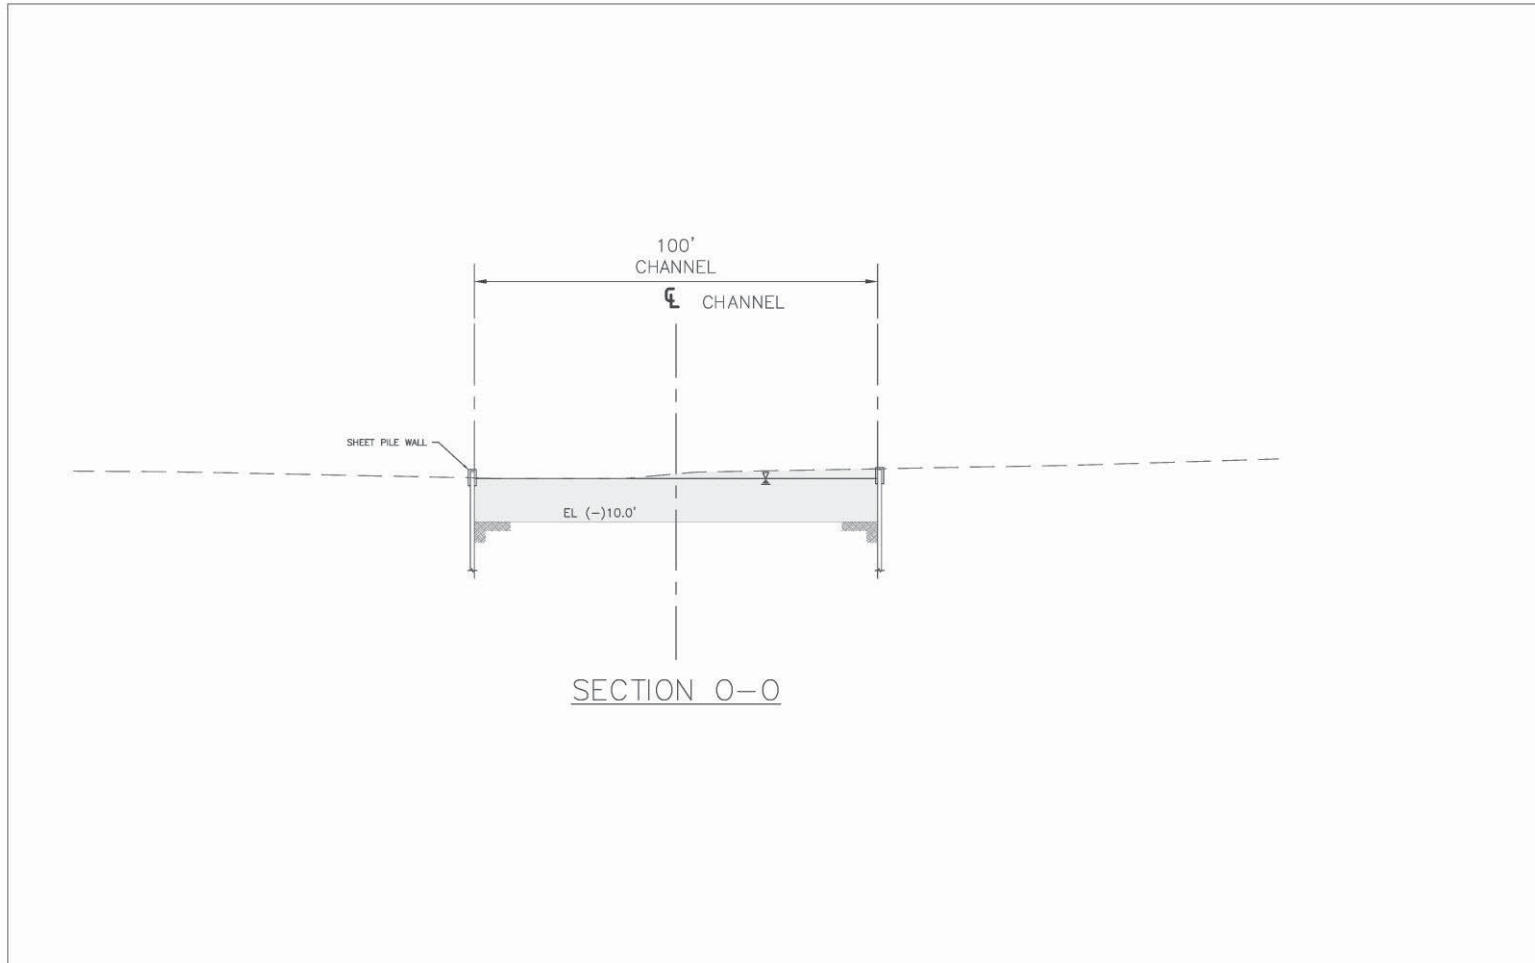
Cross Section O-O, Dr. Barbosa Avenue Bridge
